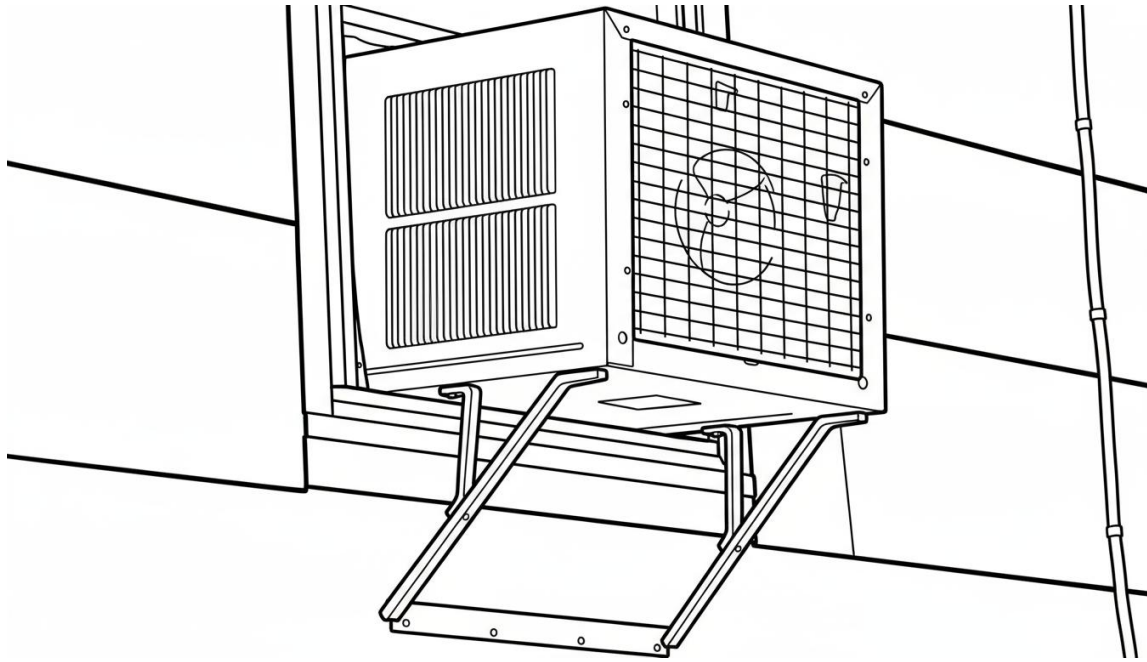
ROOM AC INSTALLATION – SUPPORTED ON BRACKETS
